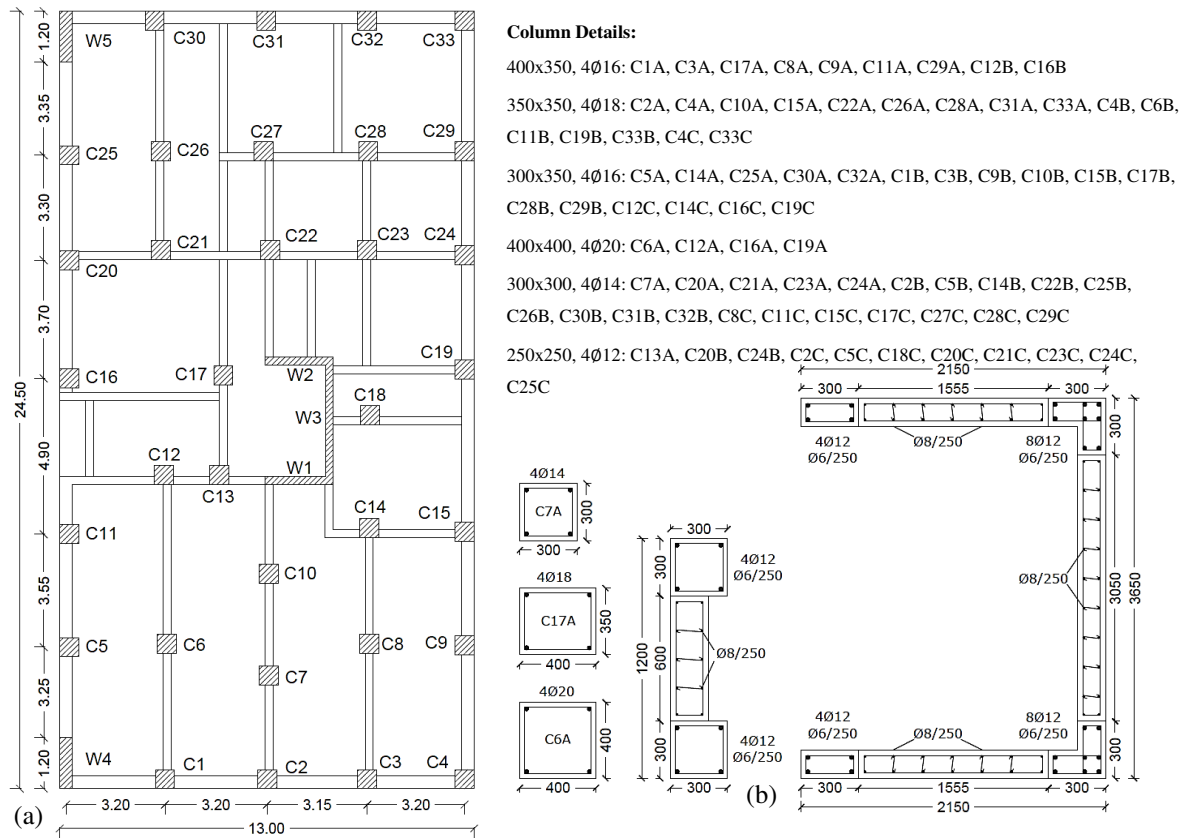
(a) Plan configuration of 1st storey of the existing building; (b) Cross-sectional detailing of columns and walls.
